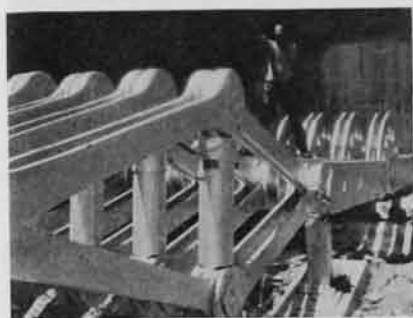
Hydraulic jacks within adjustable toggles provide for equalizing the sag of the six track cables. This installation is at the Nevada anchorage.
